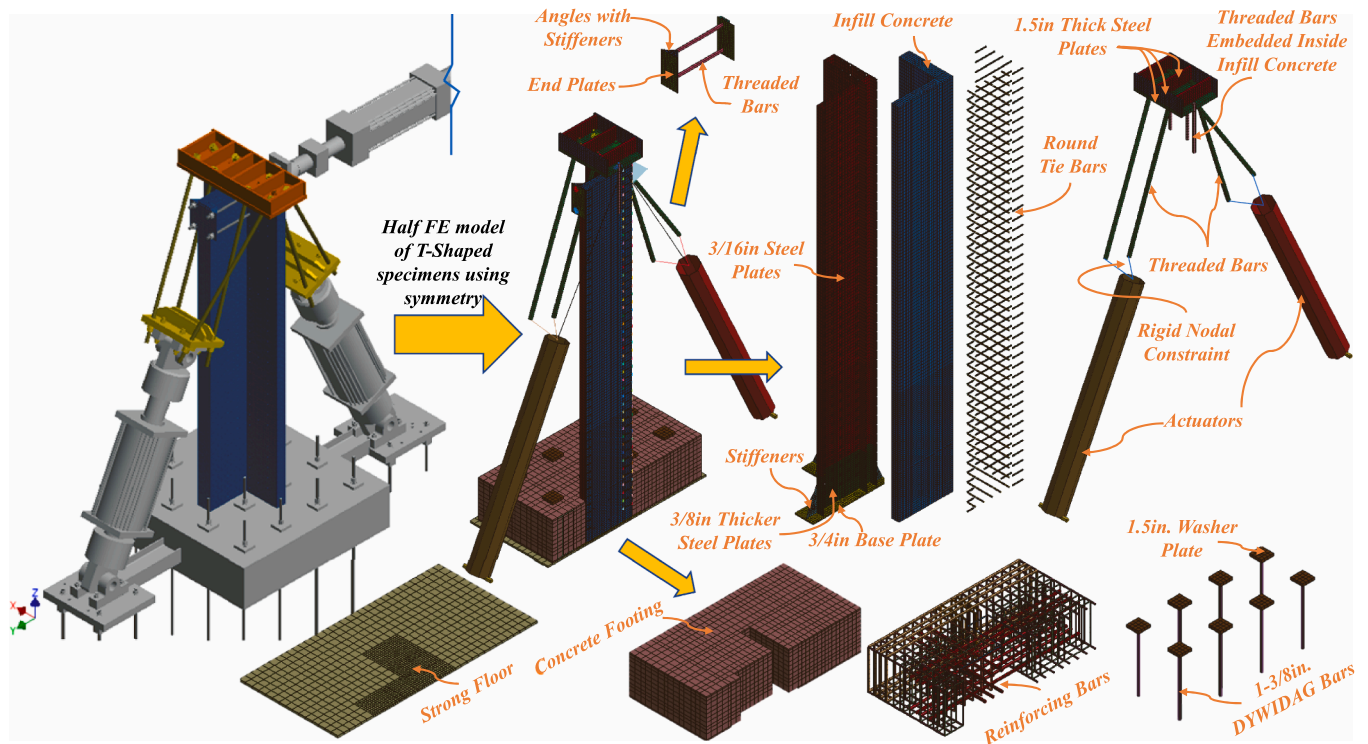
Finite element model parts of a typical T-shaped wall specimen.
